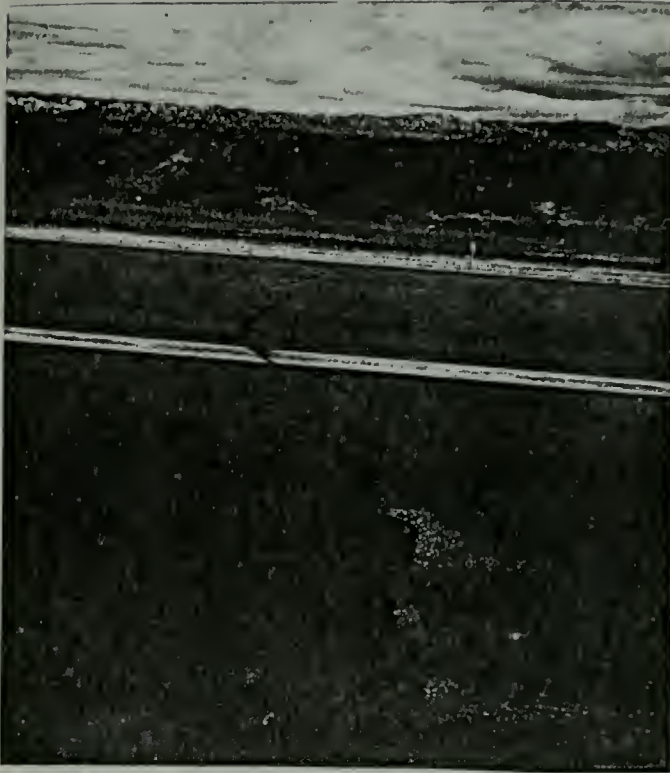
Thermal crack in East-West Runway, Nome, Alaska, paved in 1973.
